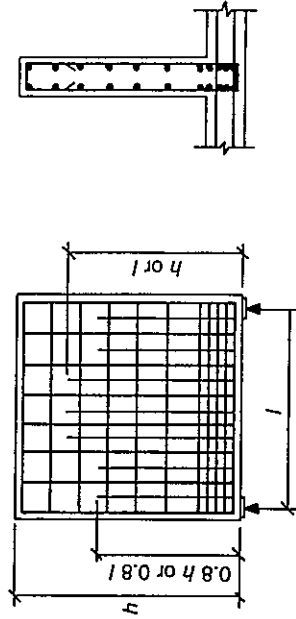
Recommended reinforcement layout for suspended loading (schematic)
